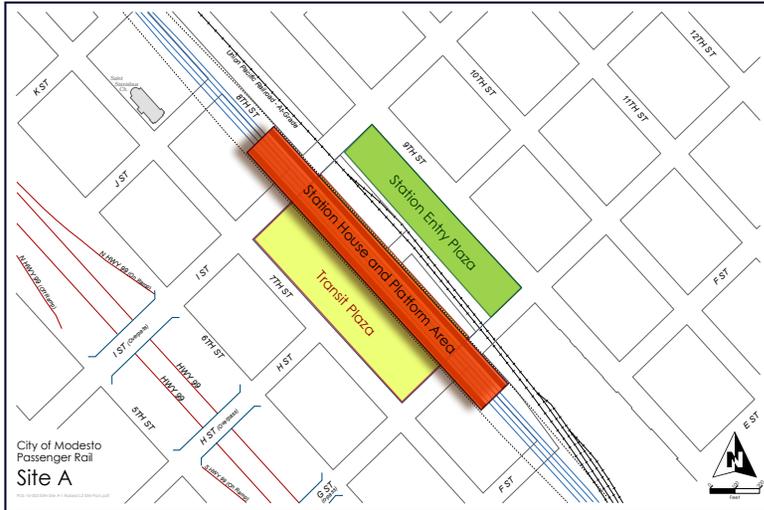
Conceptual Site Plan, Above-Grade Passenger Rail, Lower Level Plazas
